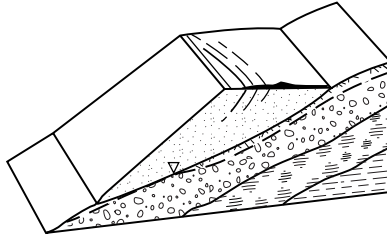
Early failure stage in sidehill fill as concentric cracks form in the pavement.
